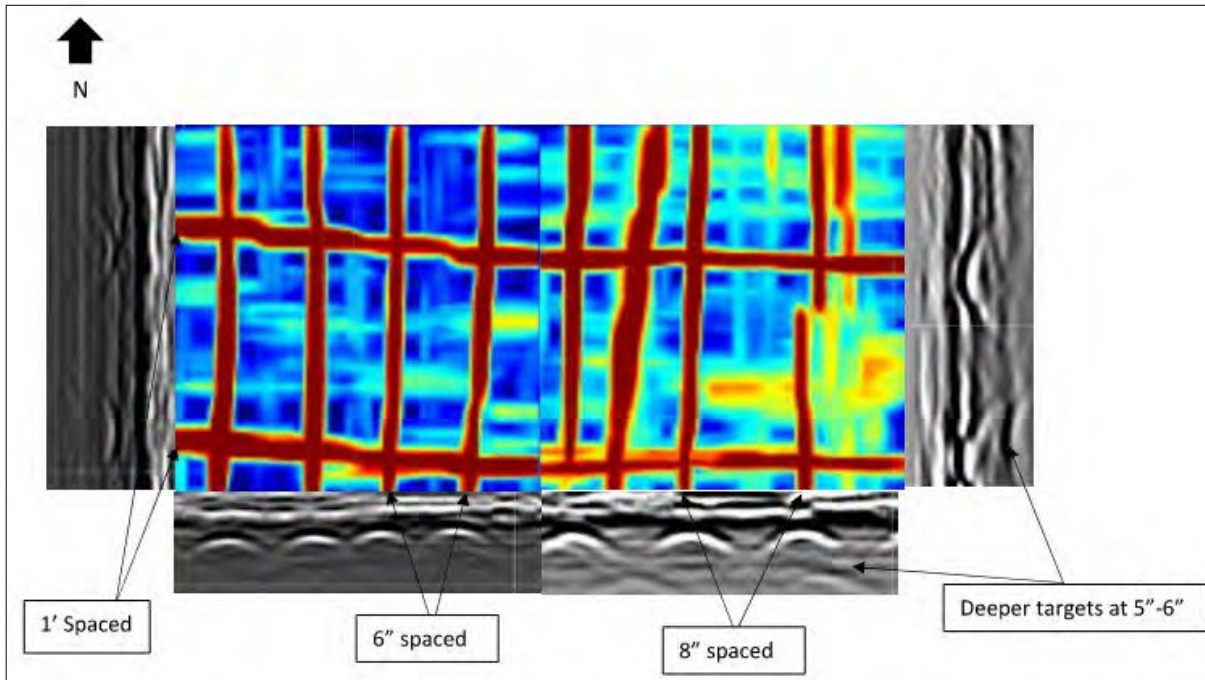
GPR scan results of retaining wall foundation slab from Holes Technology LP Report
